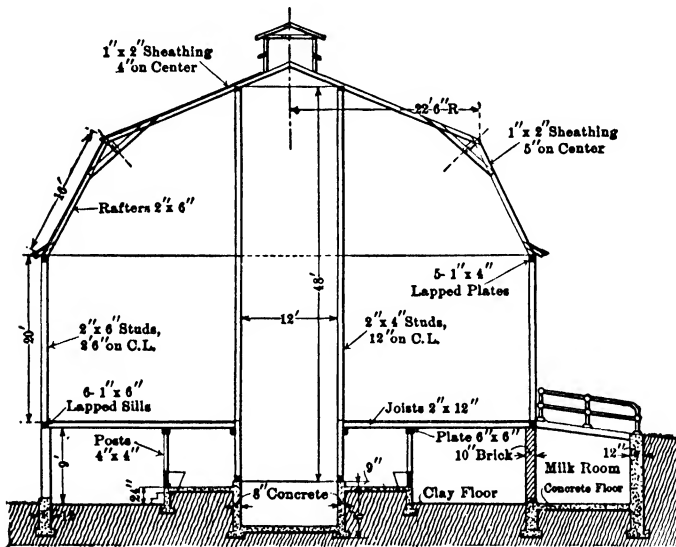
Cross-section of round house. (Ill. Exp. Sta.)
